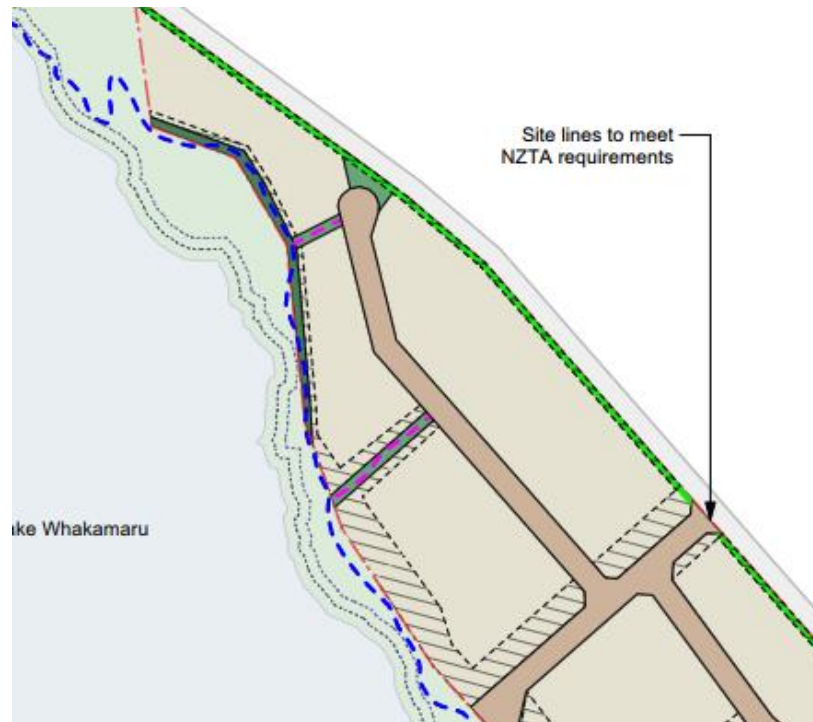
Structure Plan extract – internal road network (one access only from SH30)
